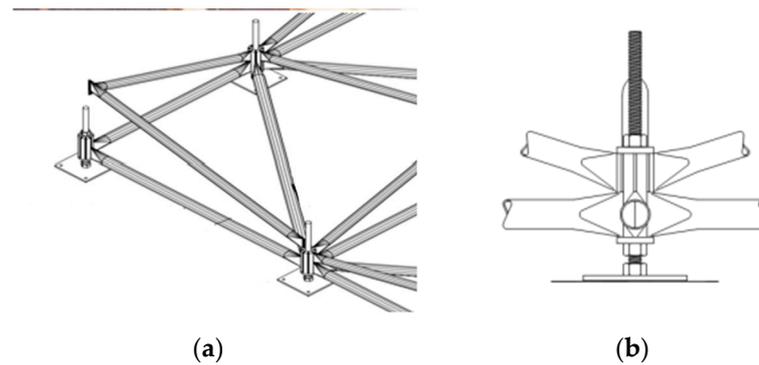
Schematic detail showing: (a) bottom hub and joints and (b) assembled connections enabling structural movement and flexibility. Courtesy of <http://multipoint-foundations.com> accessed on 16 December 2023.
